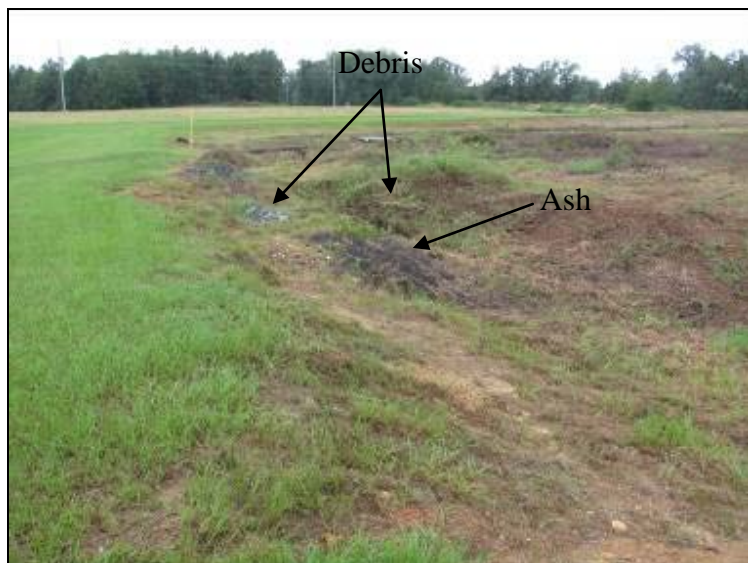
Ash Pond – Crest and interior slope southeast embankment, looking southwest. Note: Ash and debris at pond surface.
